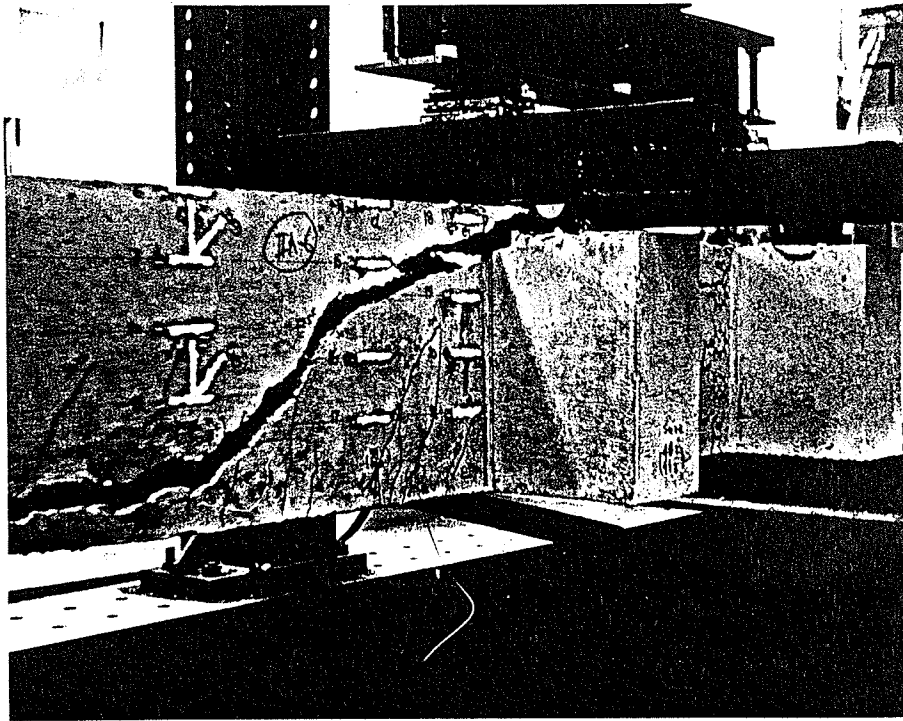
DIAGONAL TENSION FAILURE OF BEAM IIA-6
